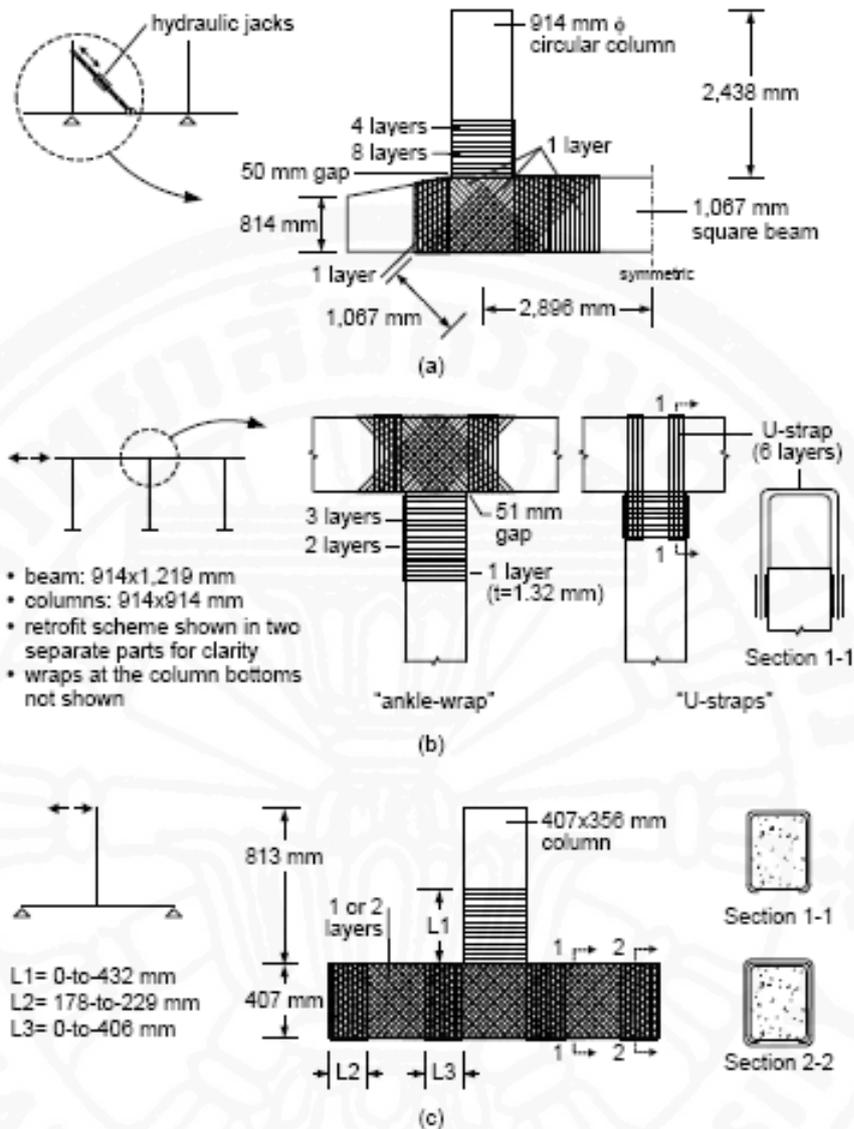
CFRP-strengthened bridge bents tested by (a) Gergely et al. (1998), inverted bridge bent laboratory test, (b) Pantelides et al. (1999) and Pantelides and Gergely (2002), bridge bent tested in the field, (c) Gergely et al.(2000), inverted laboratory test.
